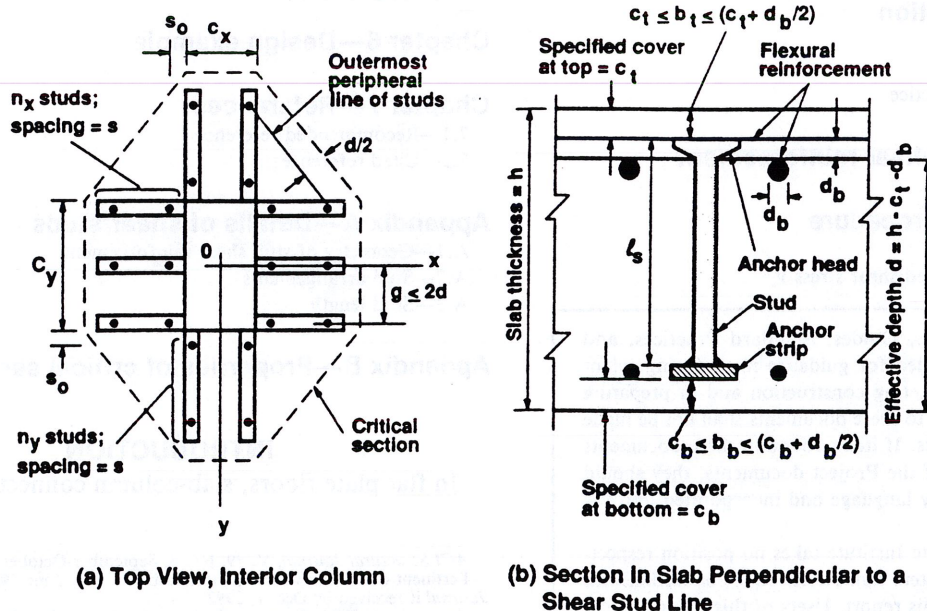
Critical section outside the shear-reinforced zone and typical arrangement of stud strips
